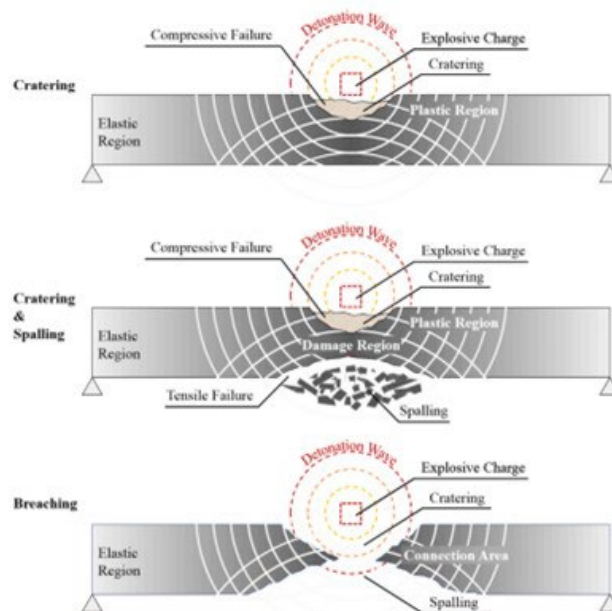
Cratering, spalling and breaching damage of concrete structures exposed to contact explosion [2].
